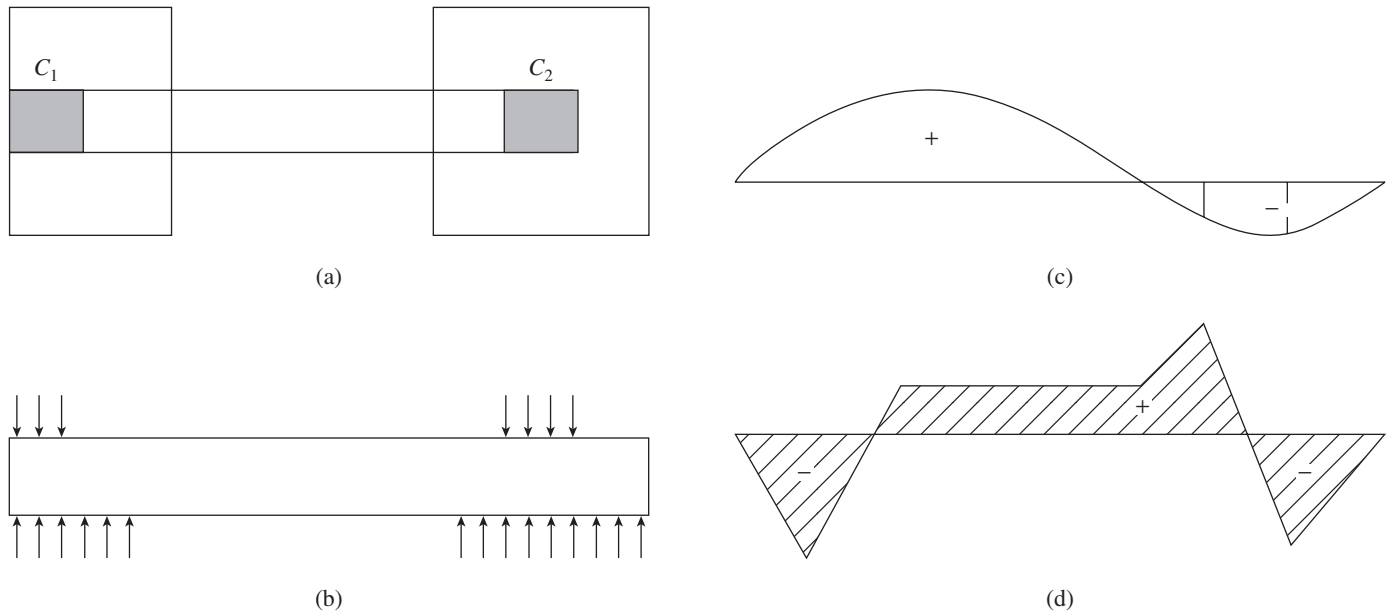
Bending moment and shear force in strap beam (a) Plan (b) Loading on strap beam (c) Bending moment diagram (d) Shear force diagram
